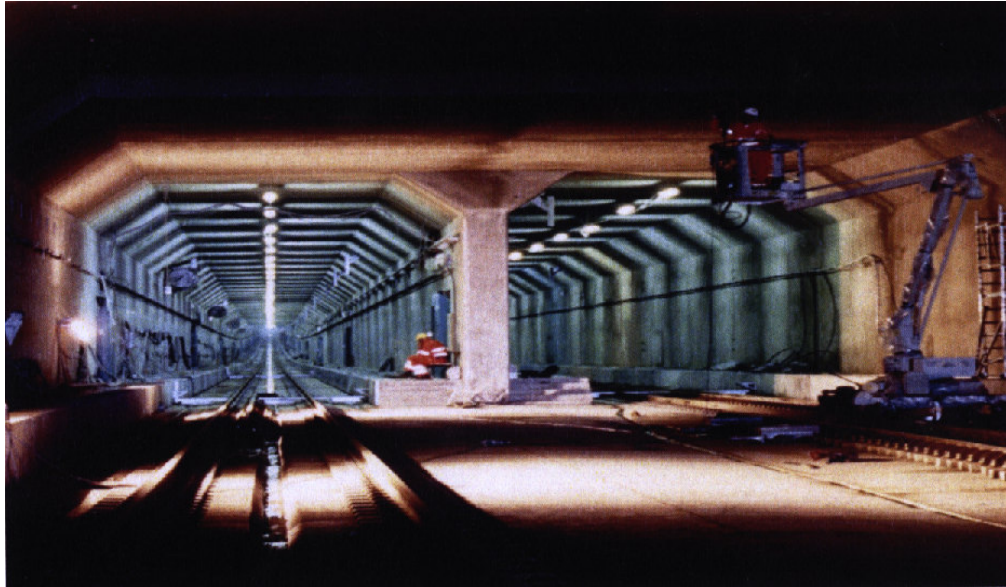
Photo Similar to Marmaray Tunnels (Construction Proposal)
